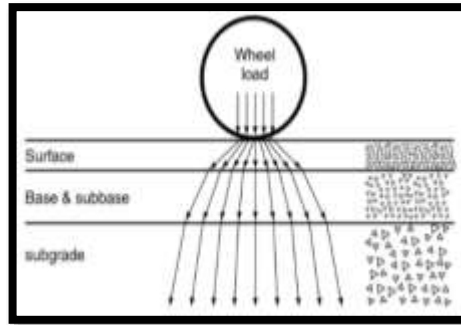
Traffic Loading and stress distribution in a flexible pavement (Austroads, 2010)
